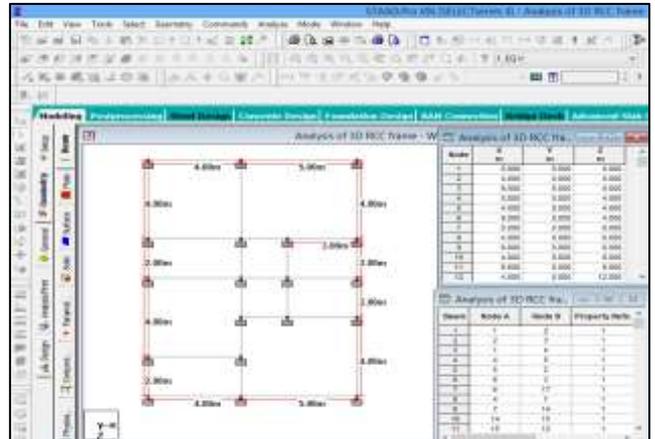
Top view of RCC framed structure in STAAD.Pro
